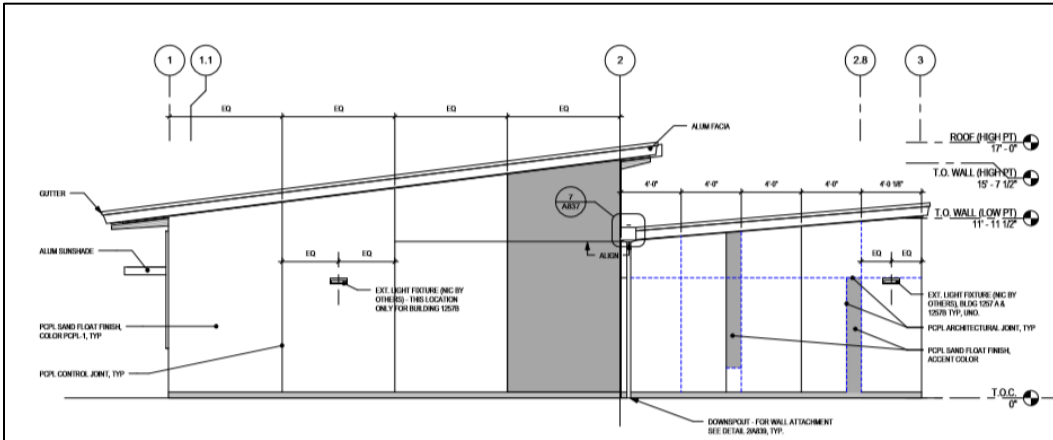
Elevation view of FROG buildings at University of Hawaii, Mānoa
